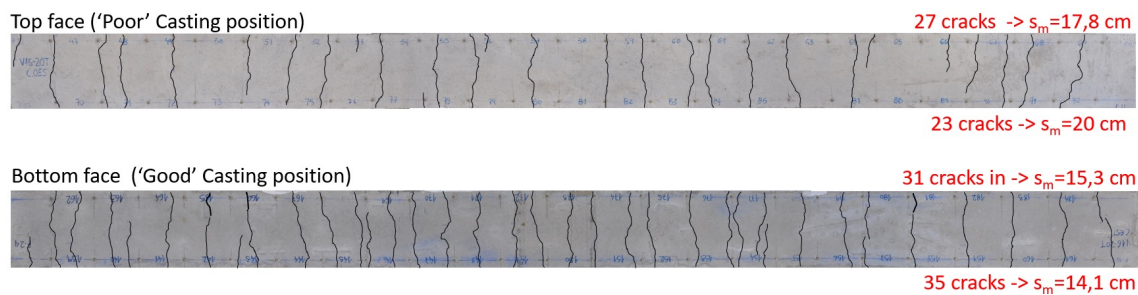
Cracking pattern of a tie showing different crack spacing on different faces.
